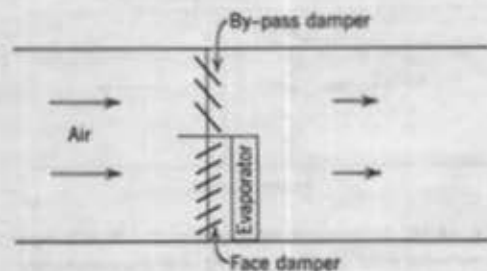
Evaporator equipped with face and by-pass dampers for capacity control. Dampers are interconnected so that by-pass damper opens wider as face damper is closed off. With this arrangement the quantity of air passing over the evaporator can be regulated by allowing more or less air to by-pass the evaporator. However, regardless of the position of the dampers, the total quantity of air circulated remains practically the same.
